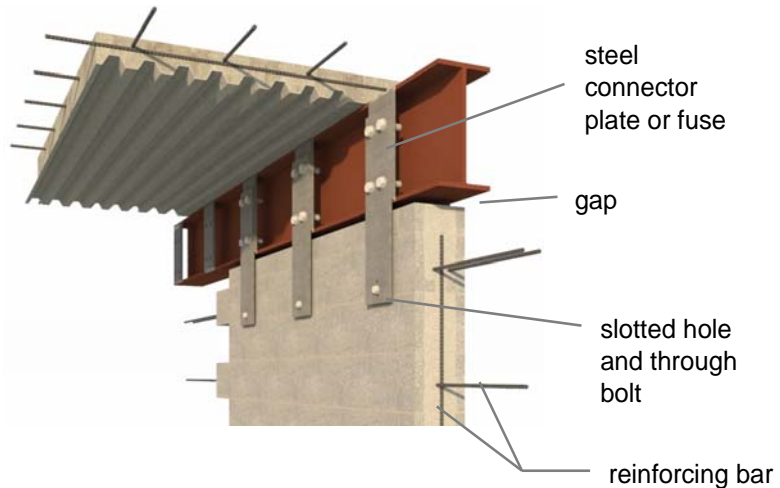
Type I Hybrid Masonry Detail (from IMI)
